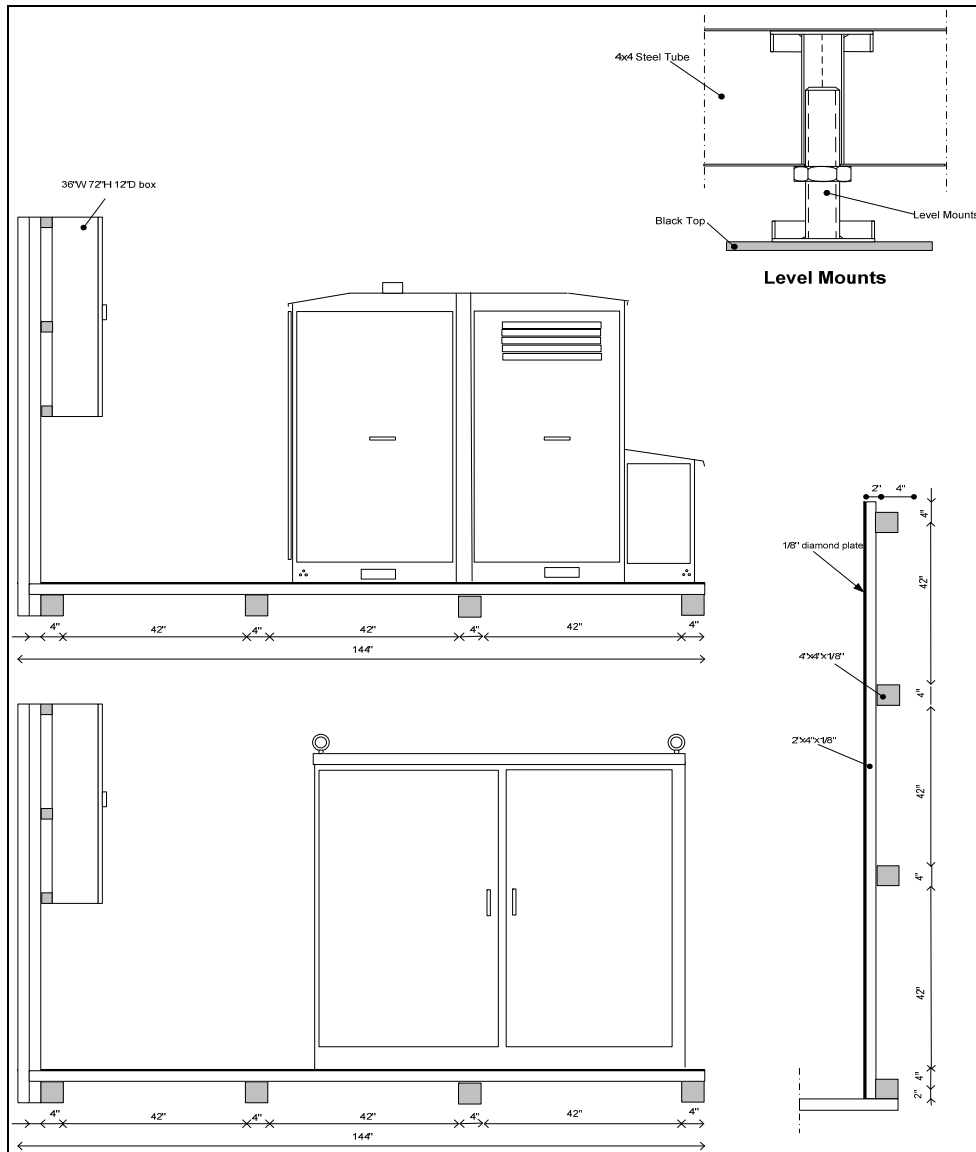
Fuel cell platform mock-up drawings – Plug Power on top, IdaTech on the bottom.
